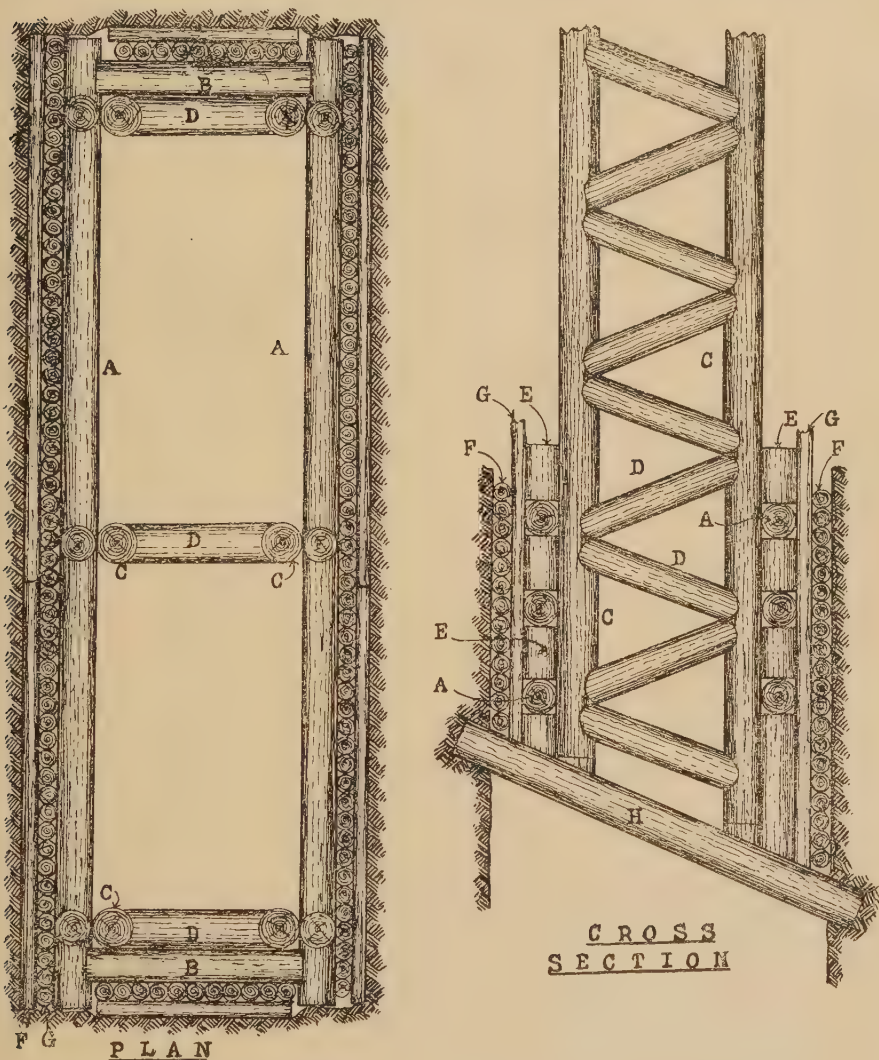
Clausthal method of reinforcing shaft timbers in heavy ground.
